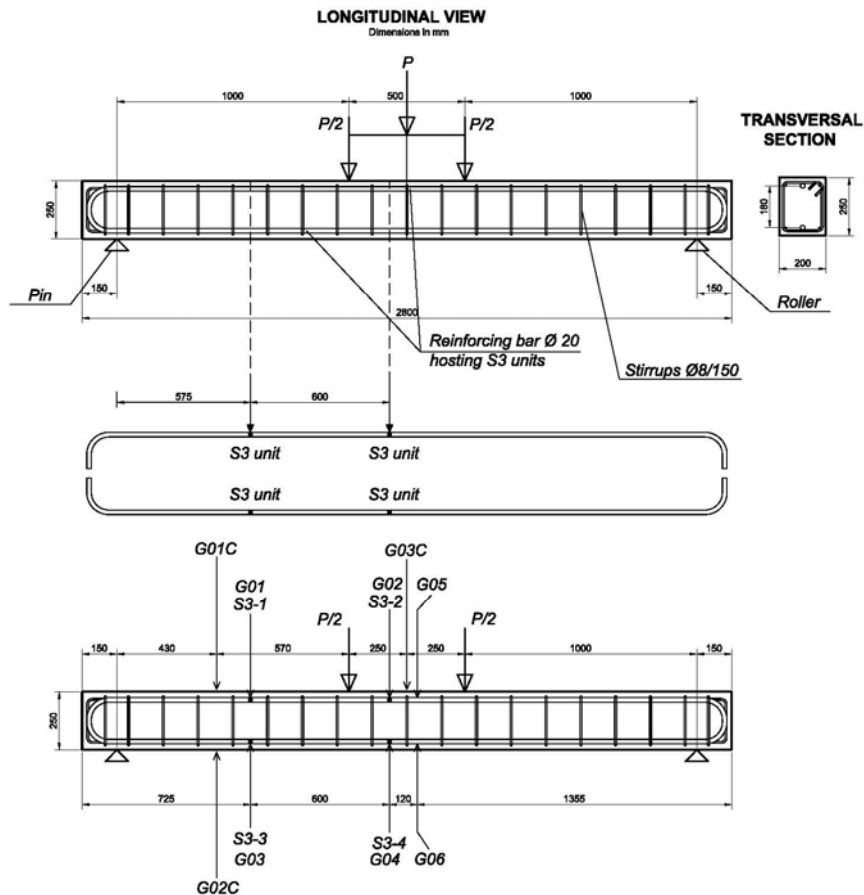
Tested beam geometry and reinforcement details. Position of the sensors on the top bar (S3-1, S3-2 and G01, G02, G05), on the bottom bar (S3-3, S3-4 and G03, G04, G06), on the top beam face (G01C and G03C) and on the bottom beam face (G02C).
